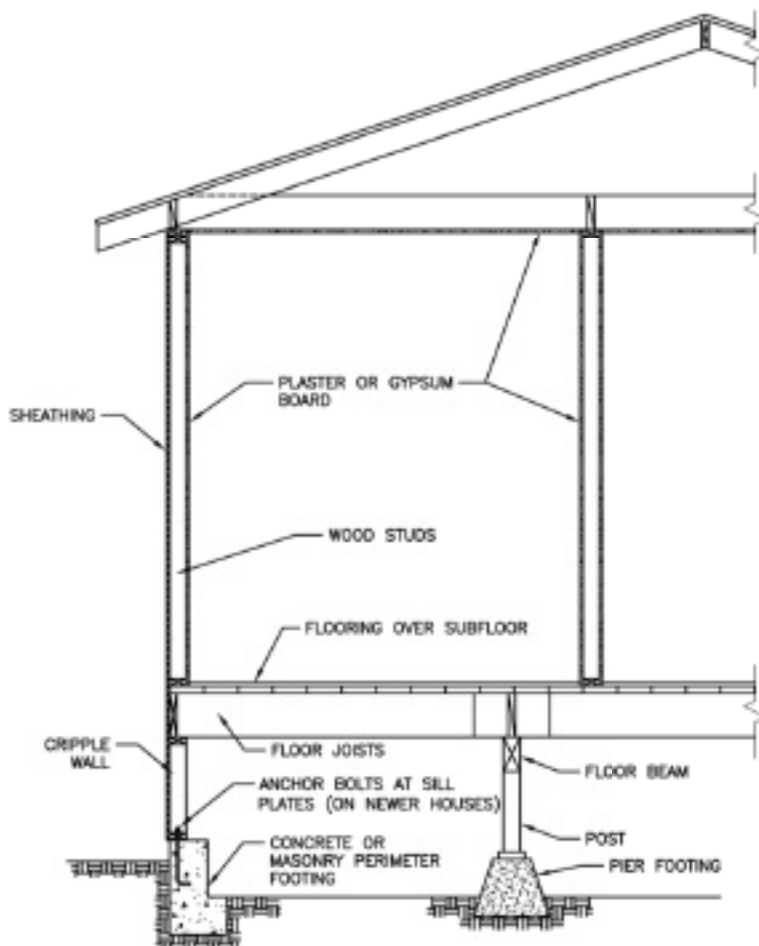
Section through typical cripple-wall crawl-space house (from ATC, 2002).
